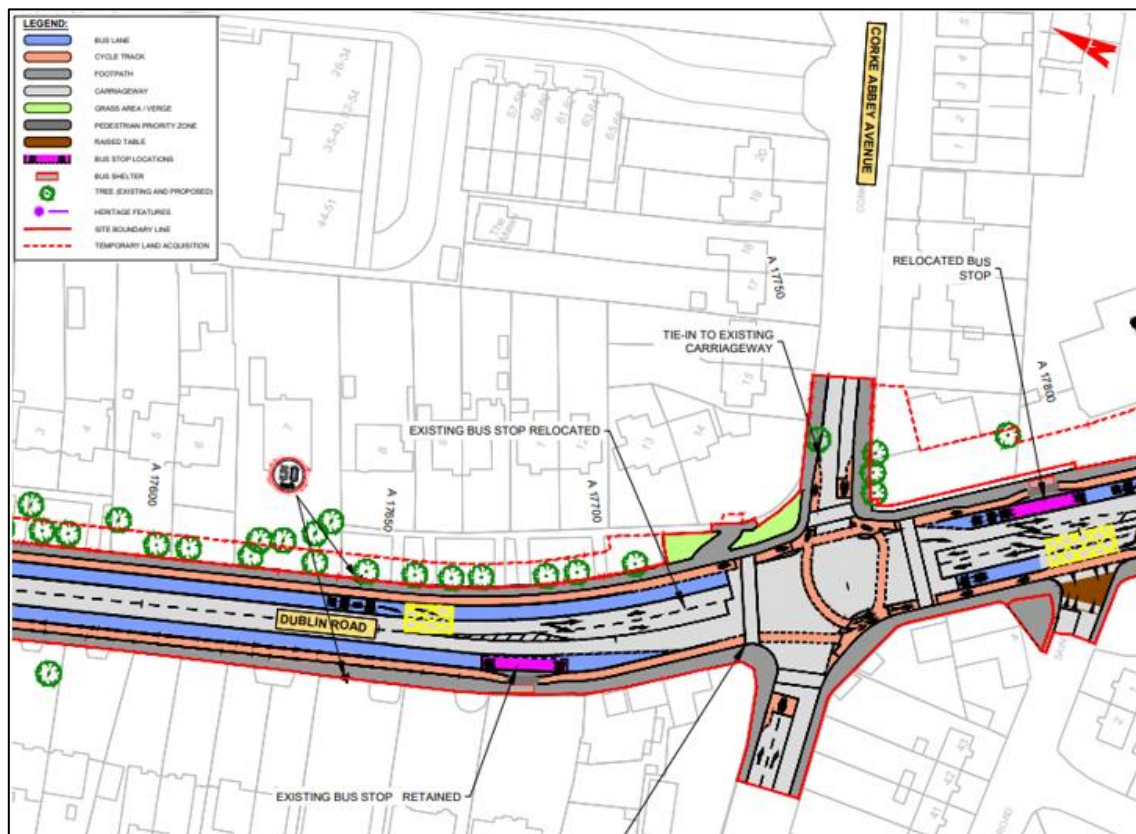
Extract from General Arrangement Drawings at Dublin Road (Sheet 50)
